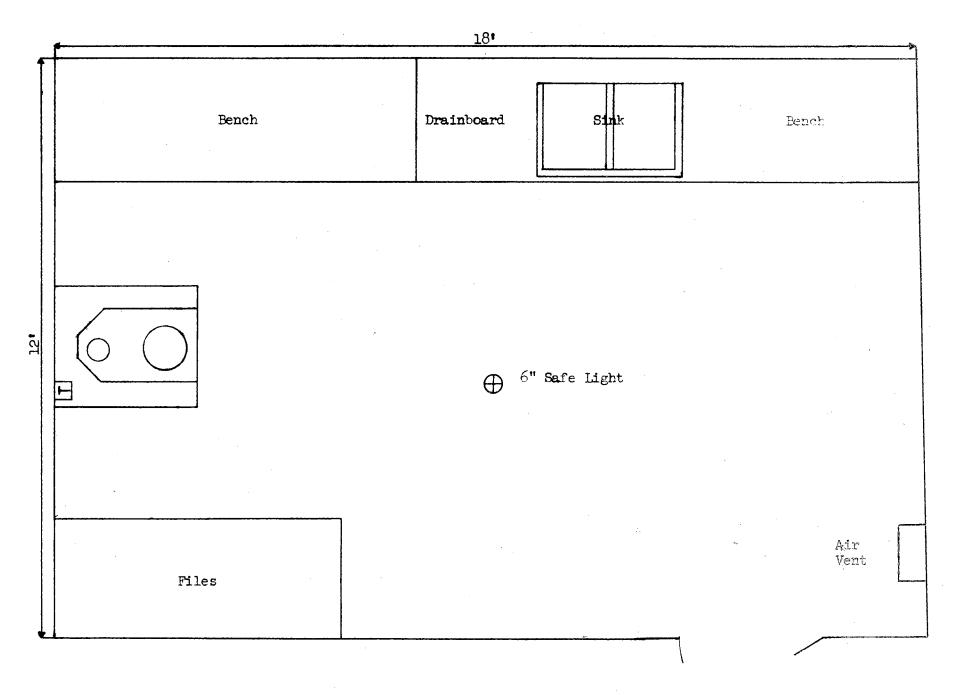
DARKROOM FLOOR PLAN - ADA EVENING NEWS. (SCALE 1/2" = 1")
